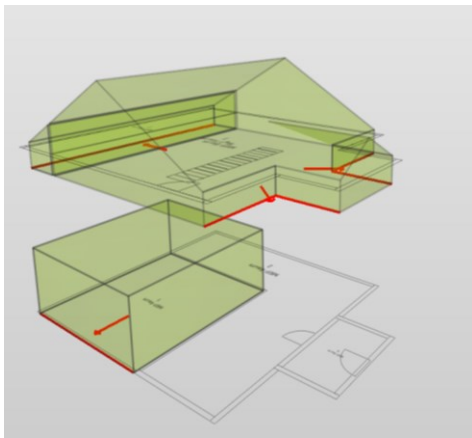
Error reporting wrong alignment of a room with curtain wall façade and knee walls
